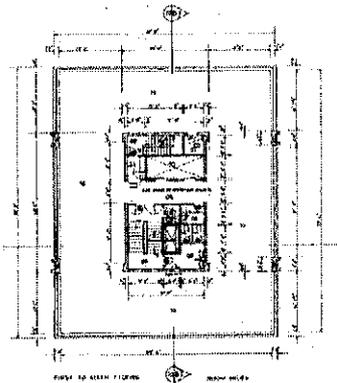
Showing the floor layout. The central stairwell/lift shaft provides stiff shearwalls that provide the buildings strength to resist lateral earthquake and wind forces.
